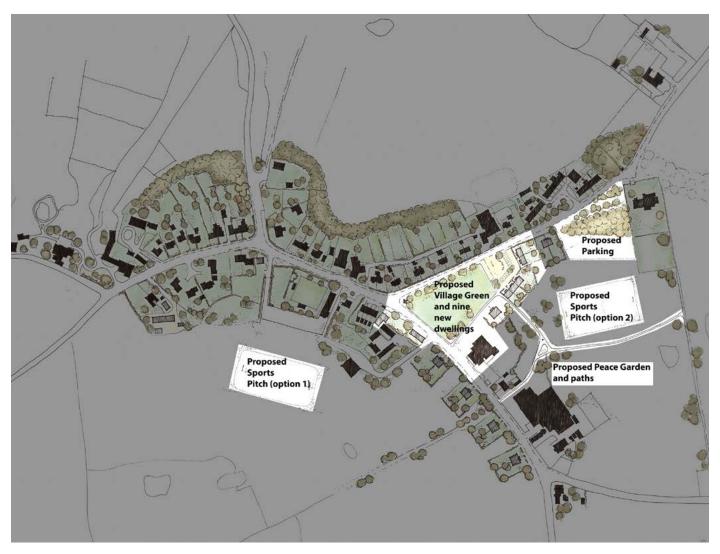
\_PHASE 1 PROJECTS ARE HIGHLIGHTED ABOVE
